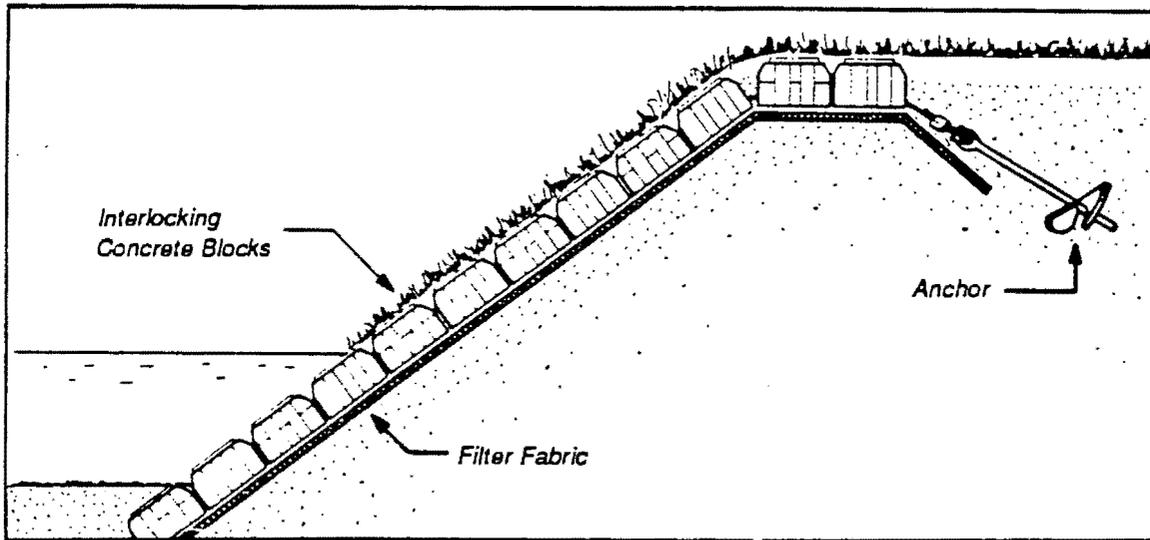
Profile of Typical Concrete Mat or Block Revetment
